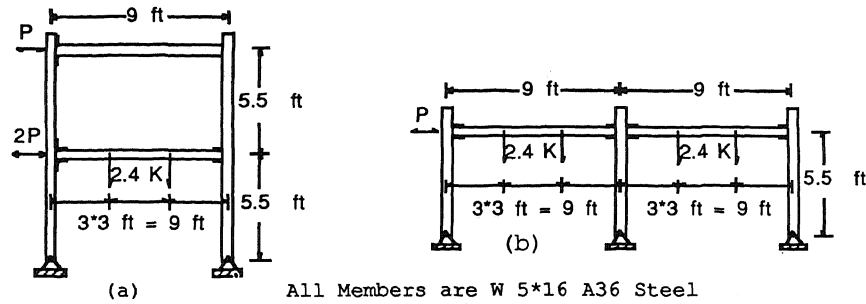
(a) Two-story, one-bay frame details. (b) One-story, two-bay frame details
